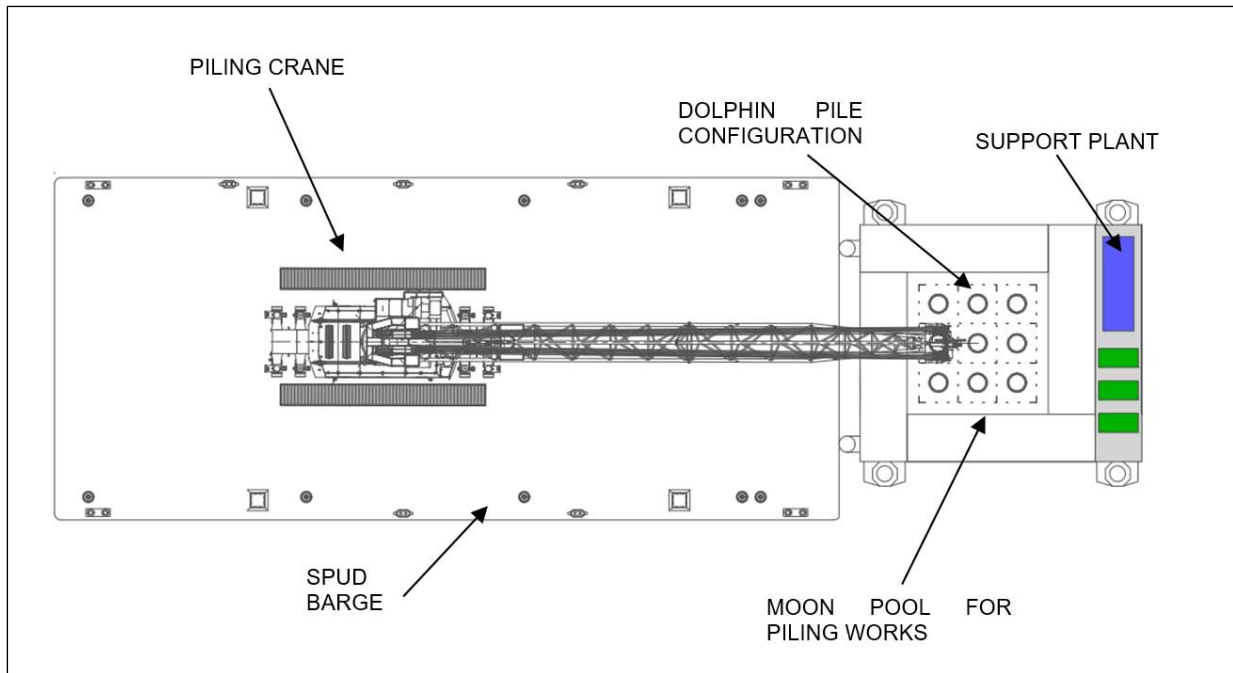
Plan of jack-up and spud-leg barge arrangement
